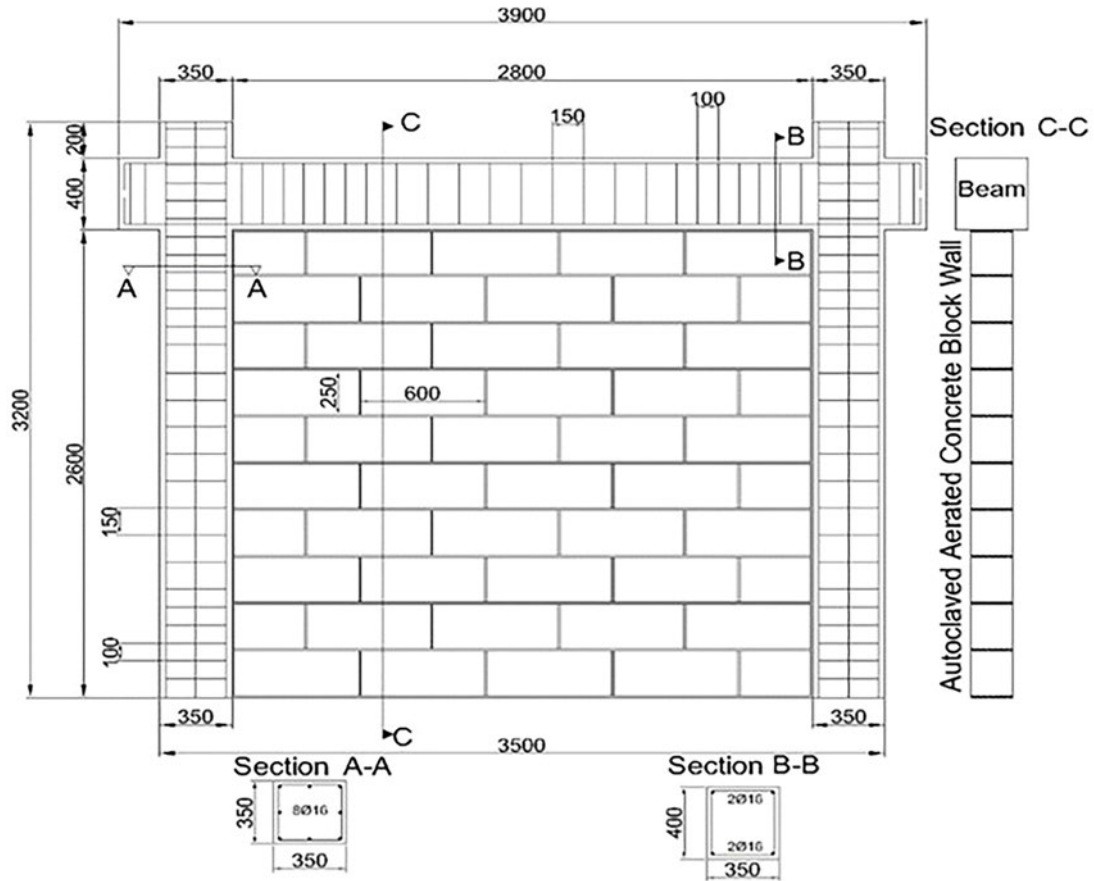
Structural layout of the RC frame with the integration of AAC masonry.
